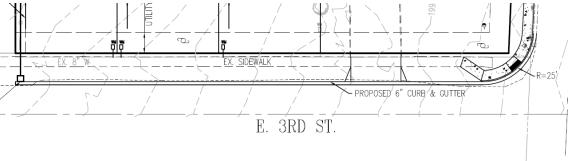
Southern portion of site along East 3rd Street contains existing sidewalks. Curb and gutter will be added.
